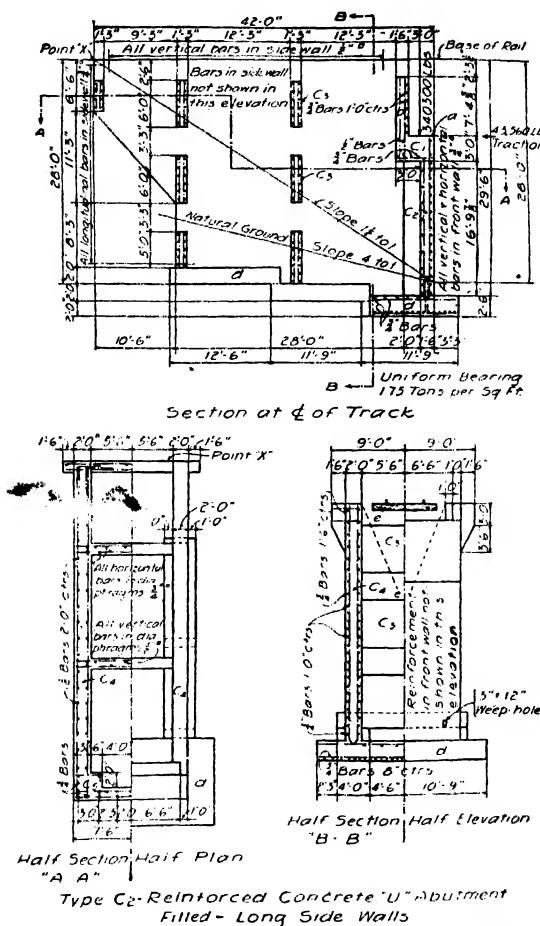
Details of a reinforced concrete U-abutment, C. M. & St. P. Ry.
